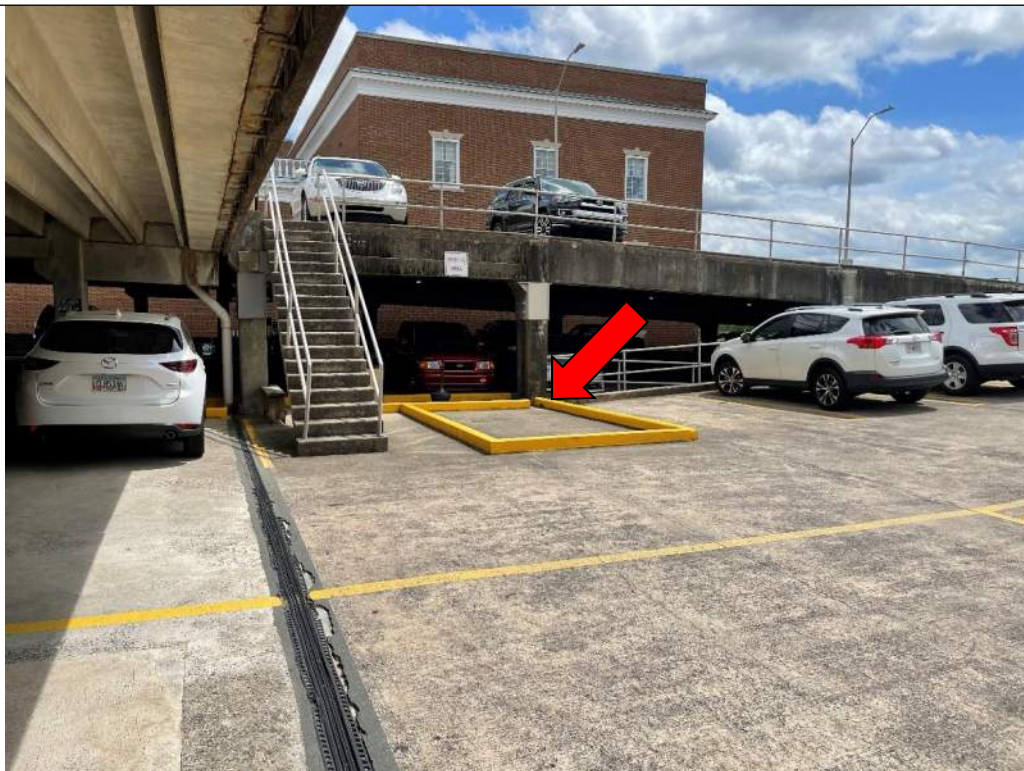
Concrete curbing installed near northeast corner of ramp at Level 3A – arrow indicates location of partially isolated drain shown in Photo 11 below
